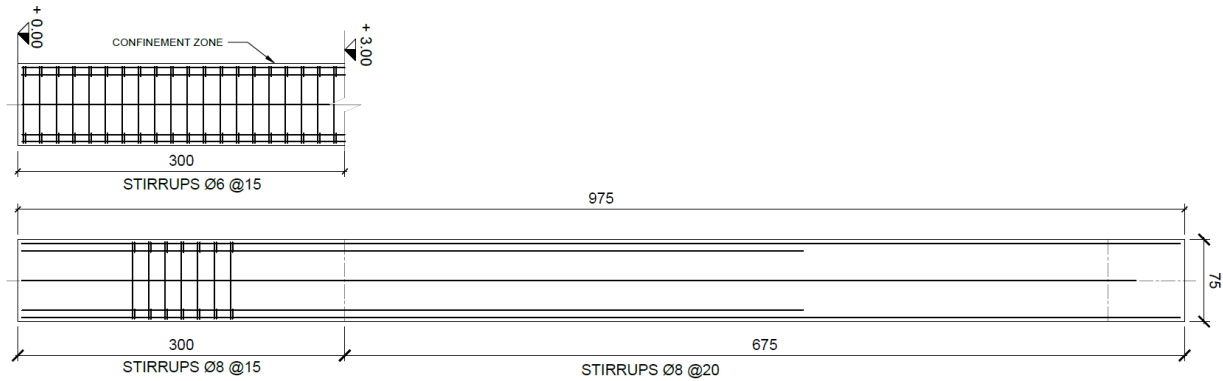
Elevation of column stirrups distribution (units in cm).
